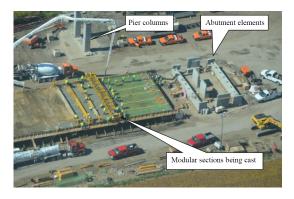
Overview of prefabrication site [Federal Highway Administration, 2013]
